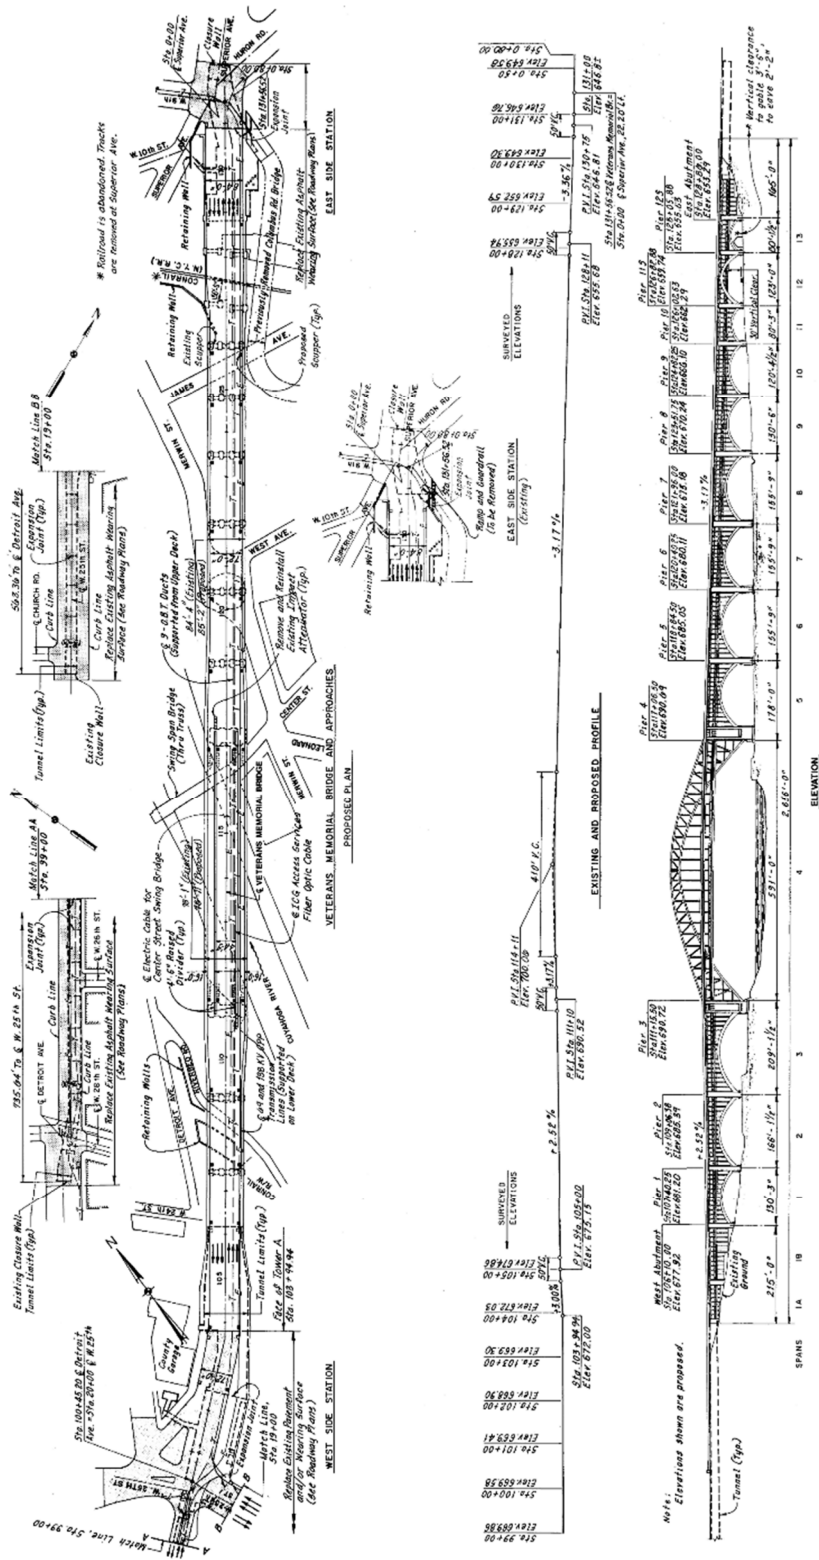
CUY-6-1456 Plan & Elevation (Veterans Memorial Bridge Rehabilitation Plans, 1994).
